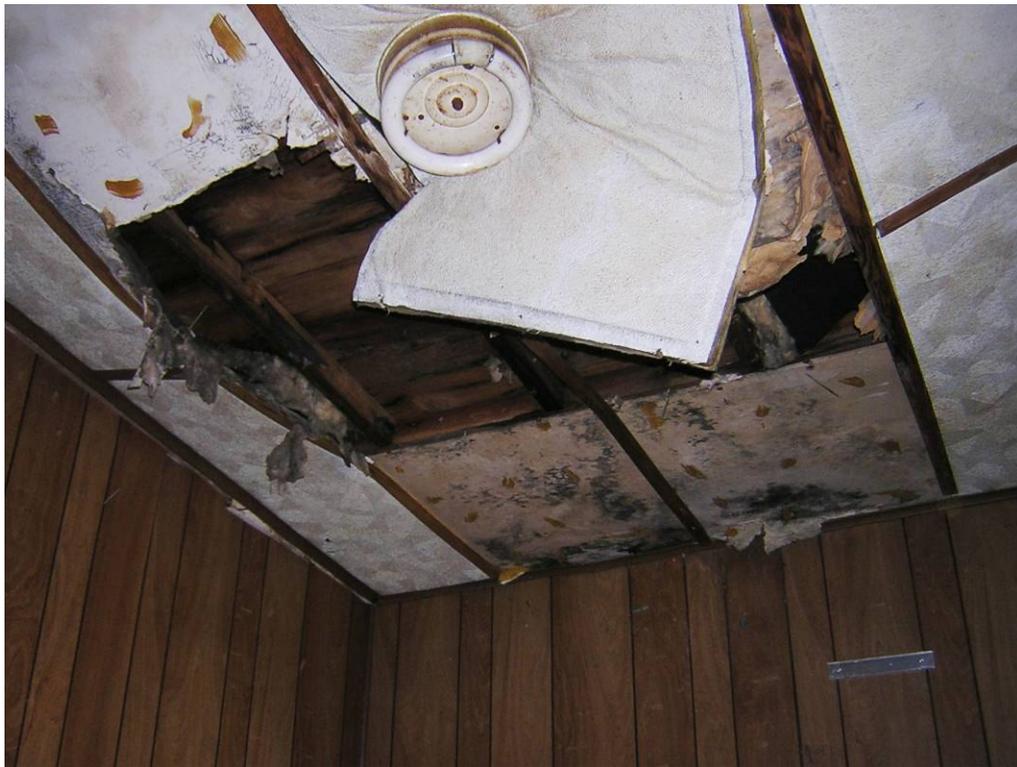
Roof Framing Water Damage at Wood Framed Structure
